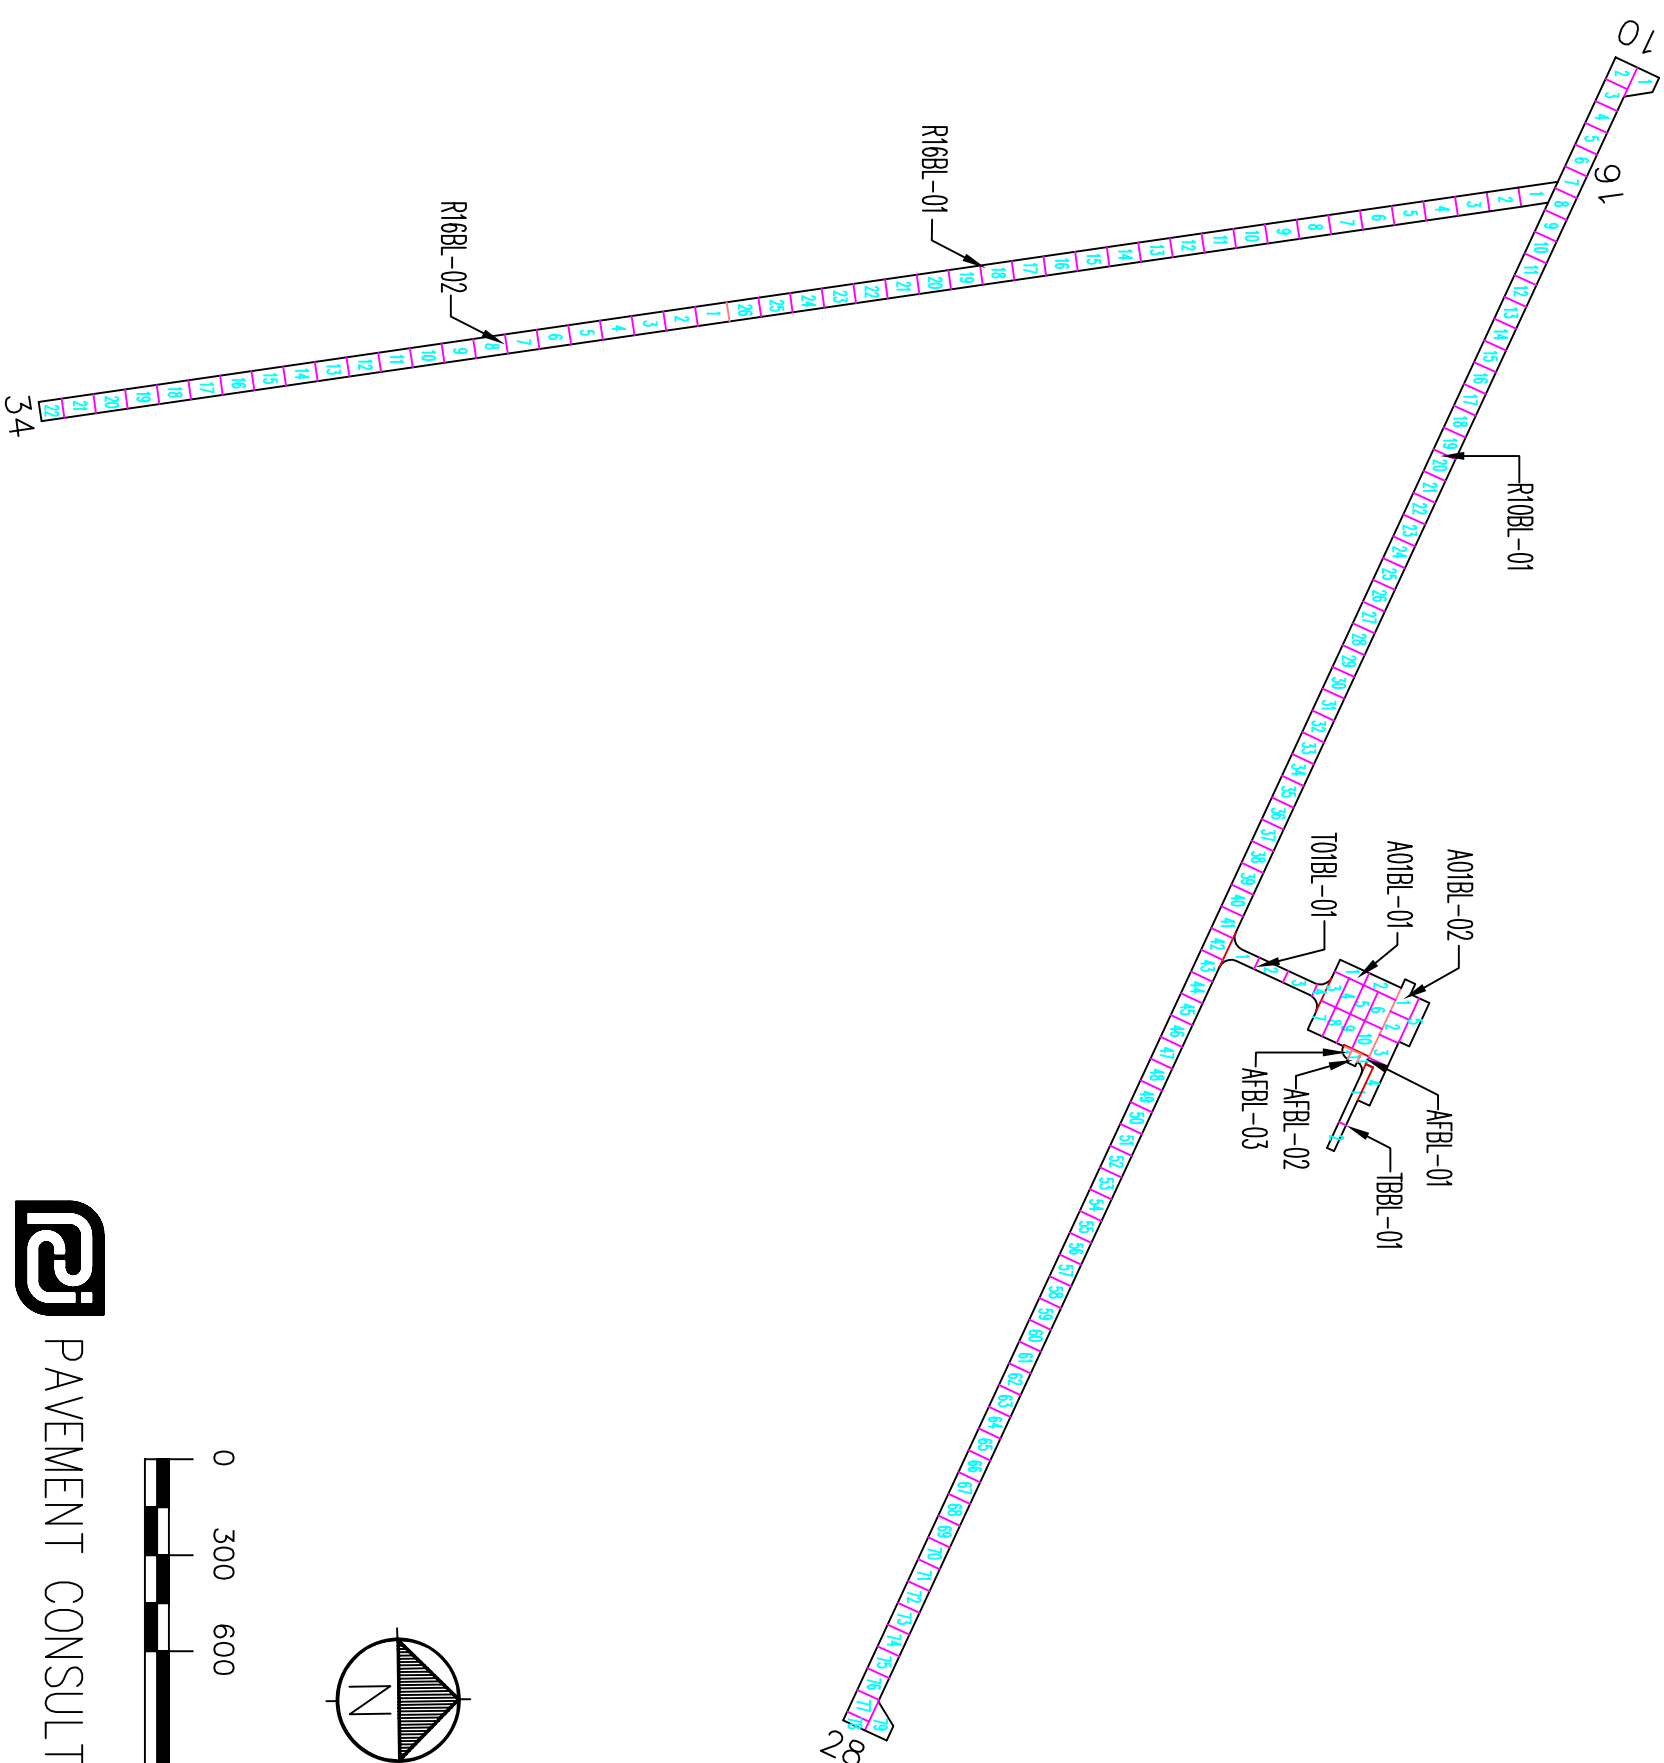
Pavement Branch, Section and Sample Unit Layout.
